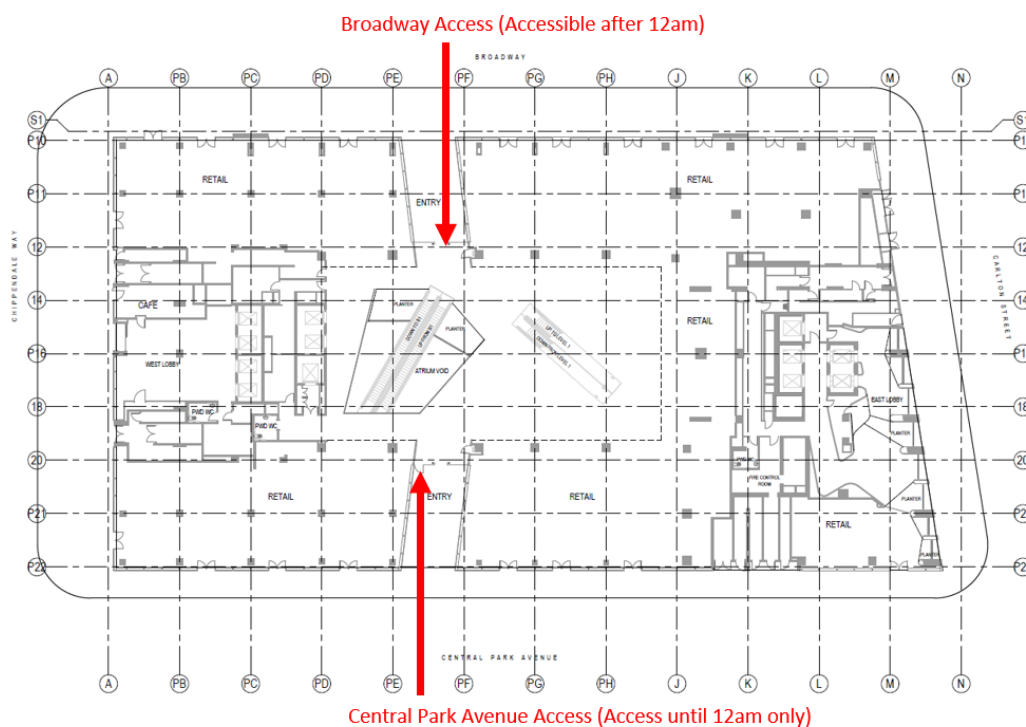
Late night trading hours under Section 3.15.4 of SDCP 2012
